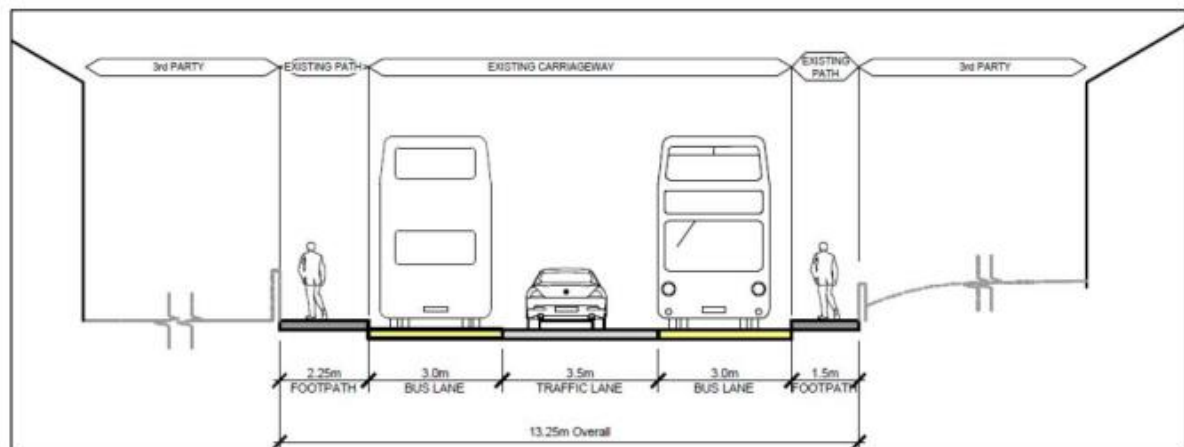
SY1C Cross-Section A-A Swords Road South of Omni Shopping Centre
